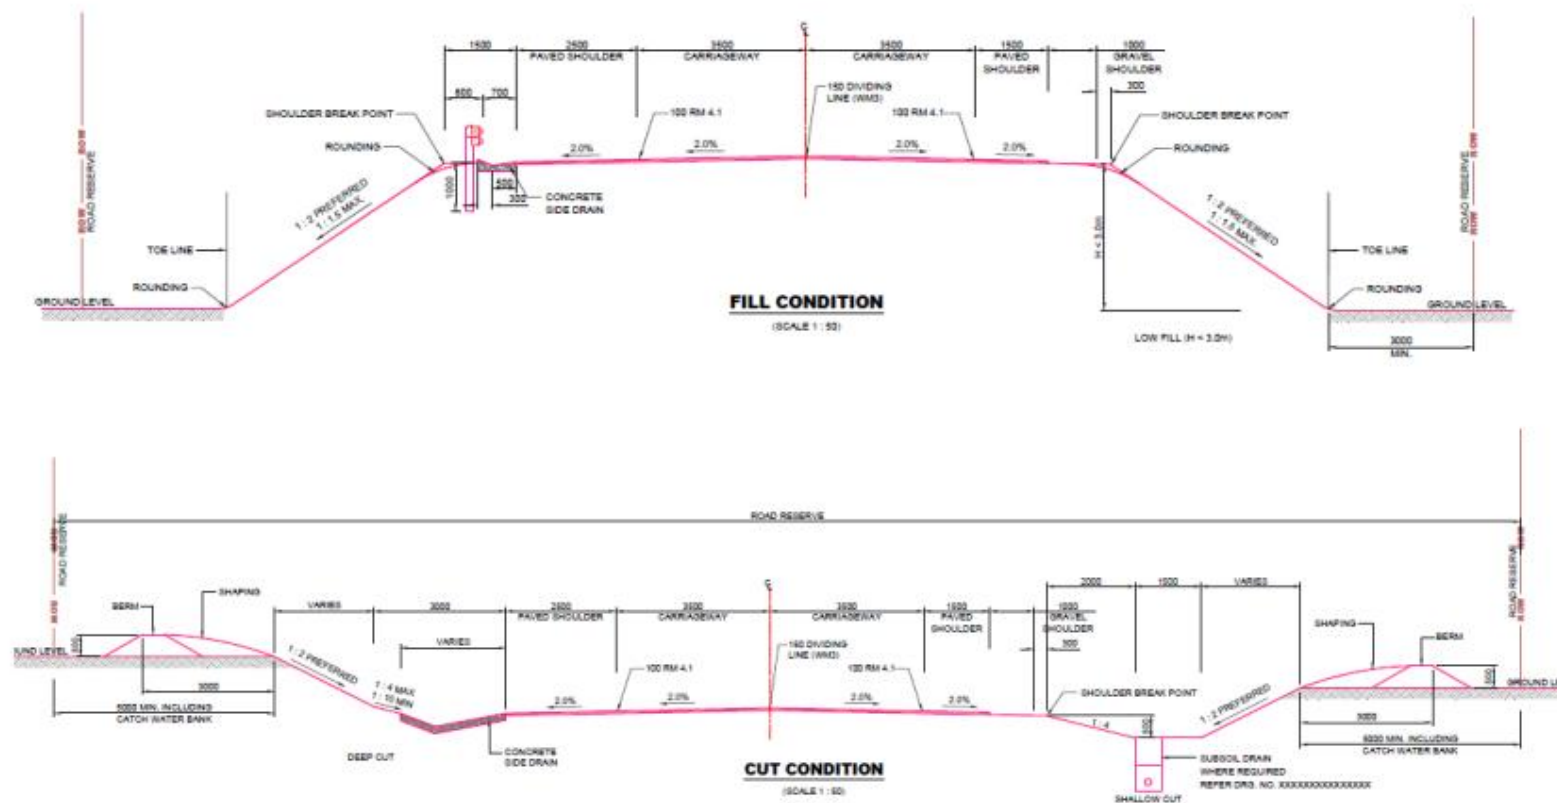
Typical applicable cross sections for road design (Source Inception Report, LASA, March 2024)
